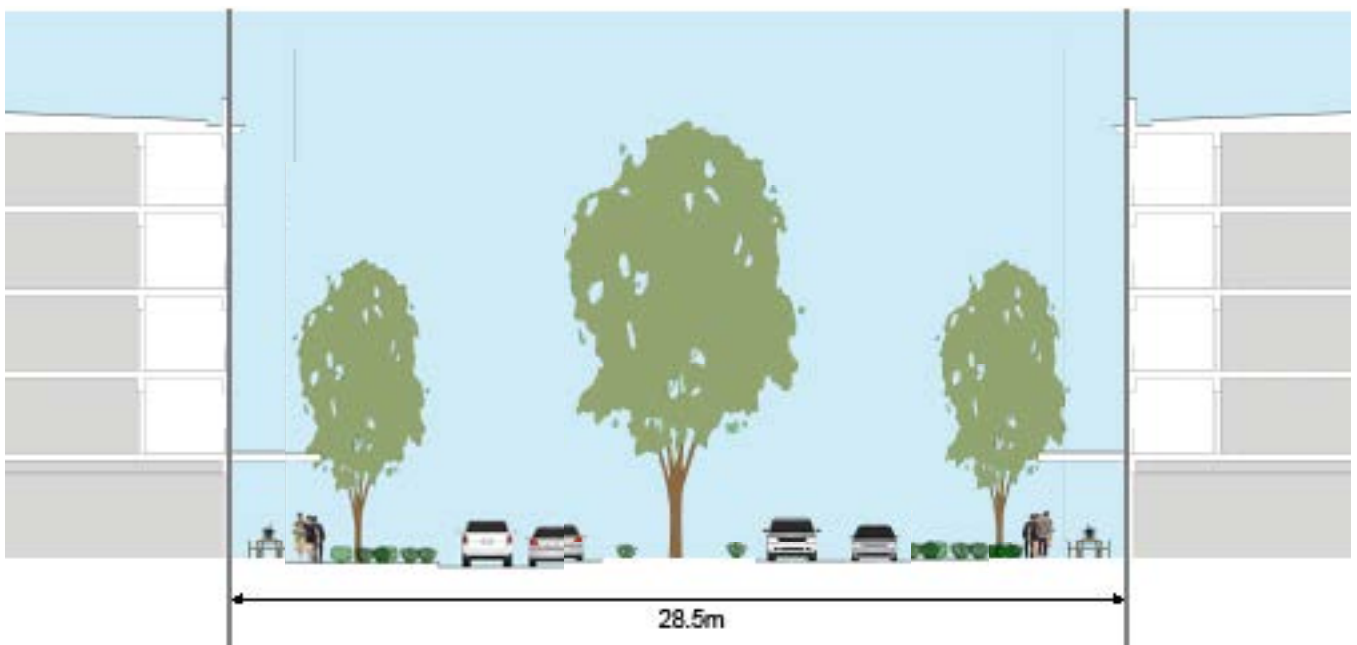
Street Type 2: Main Street between Federal Street and Hutton Street with long term peak bus lane and off-peak parking lane (28.5m)
